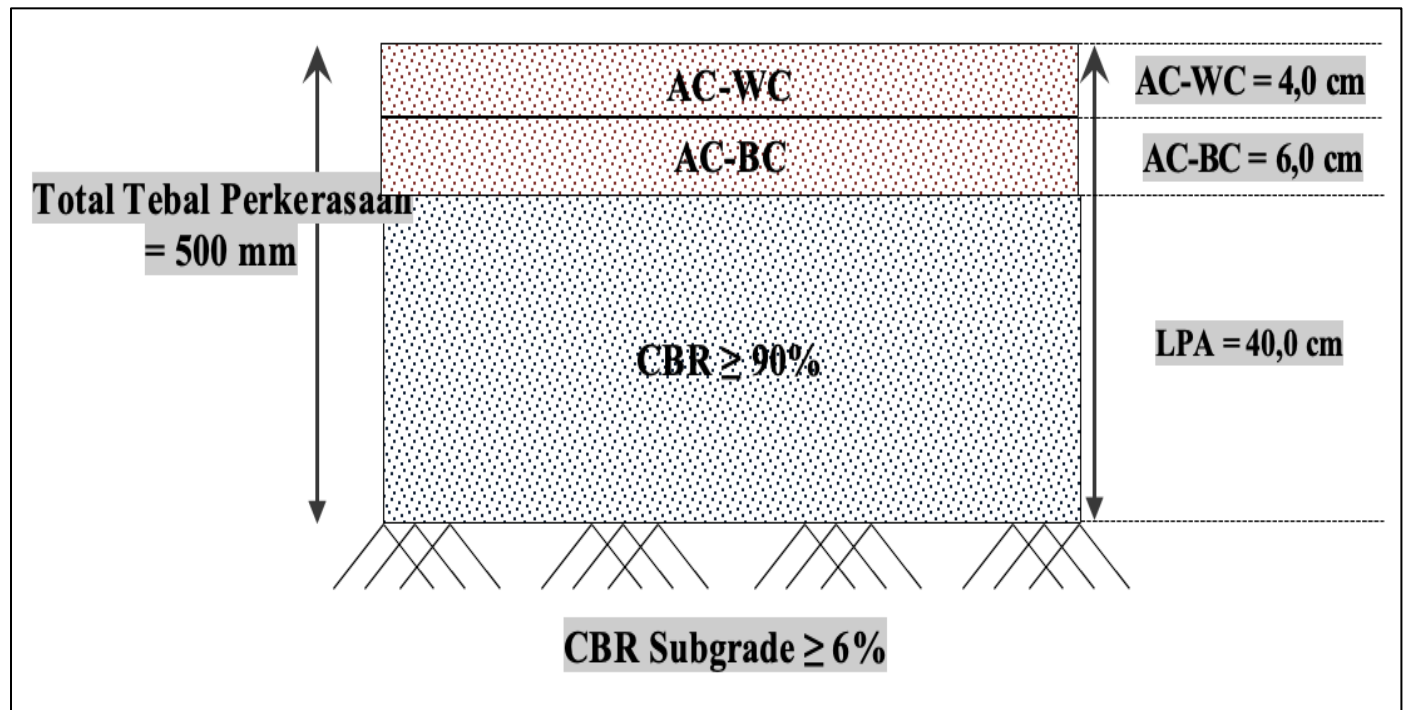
Pavement Structure of Adam Malik Road Based on MDP 2017
